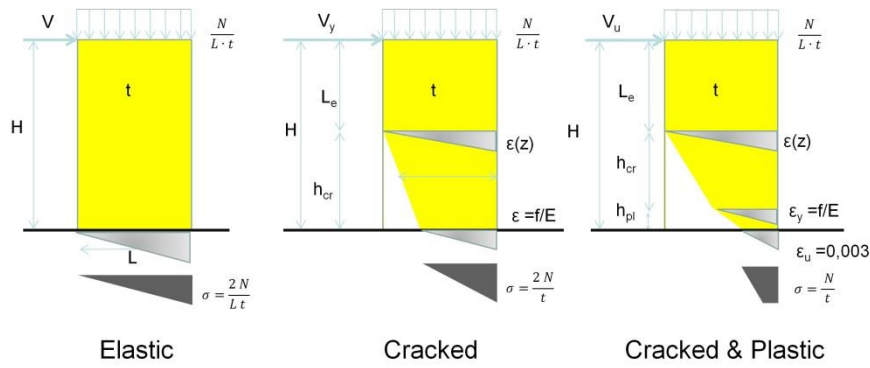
Wall panels: elastic, cracked, cracked & plastic
